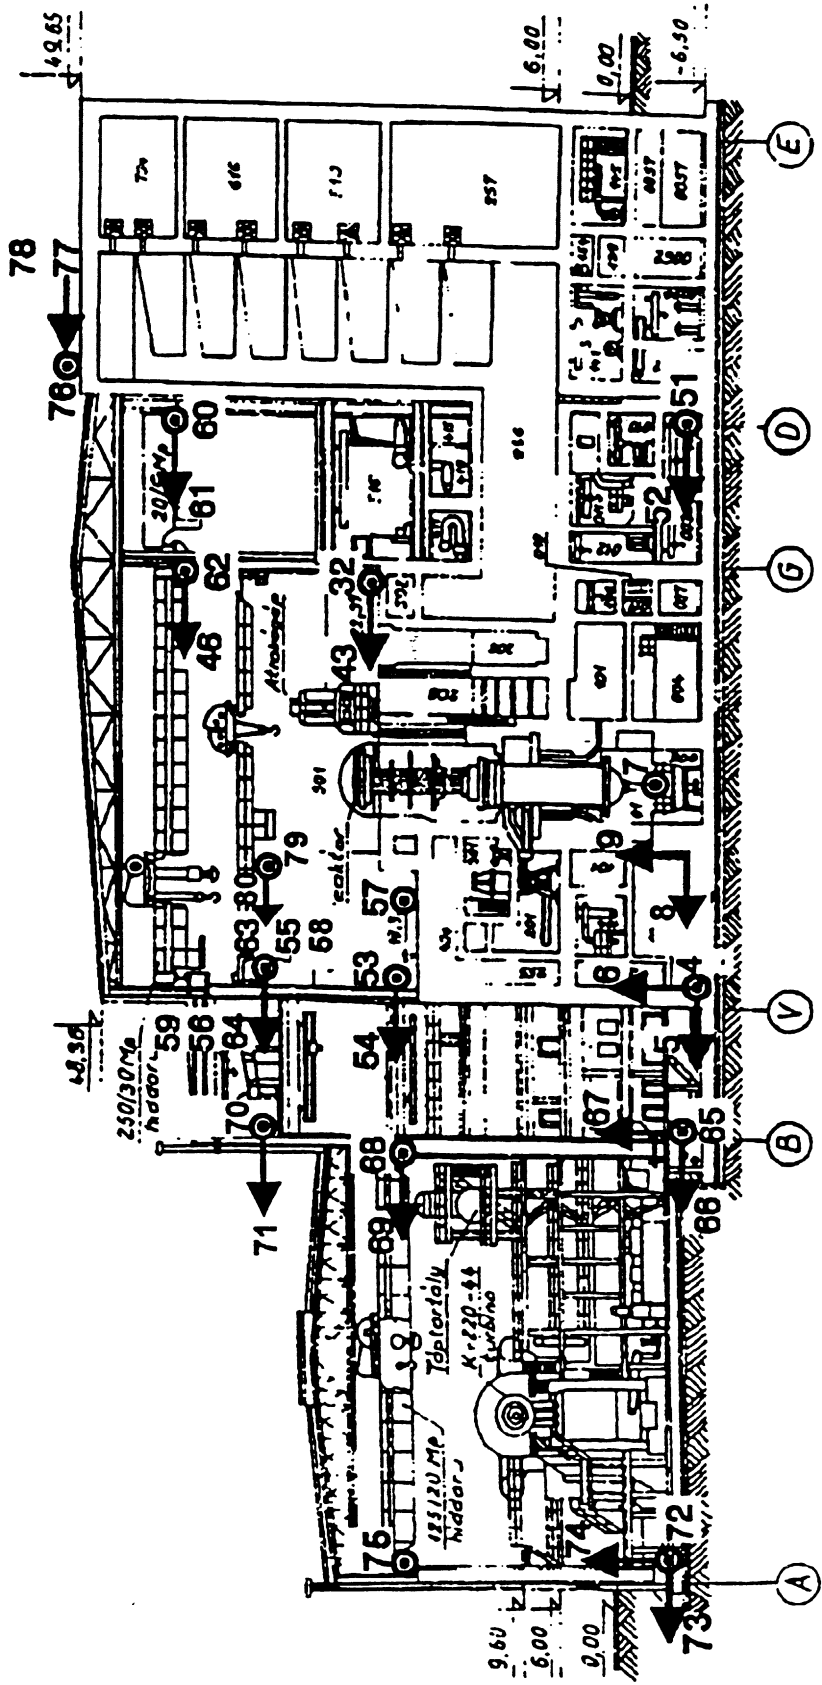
Instrumentation layout for the second experiment at Paks NPP — main reactor building (1st Block) — transverse cross-section view.
